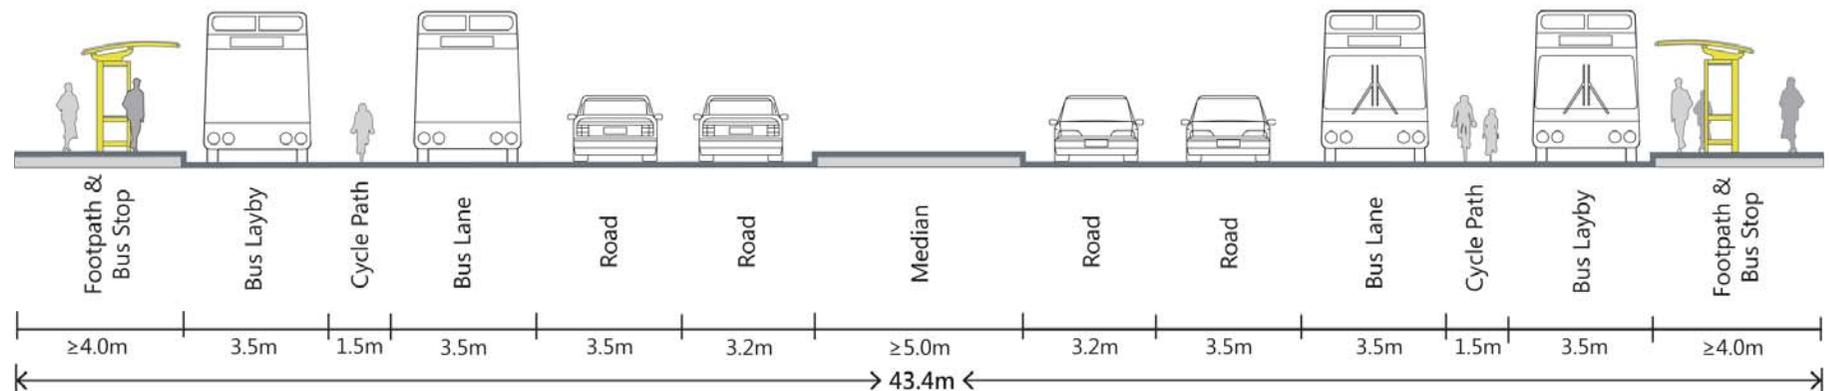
Typical Future Cross-Section of Whitfords Avenue upon BRT Implementation
